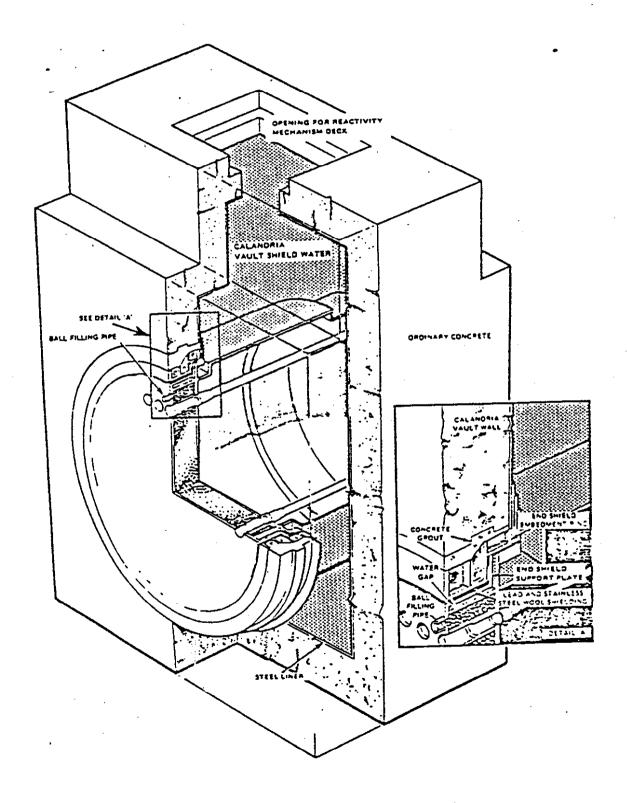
CONCRETE CALANDRIA VAULT
